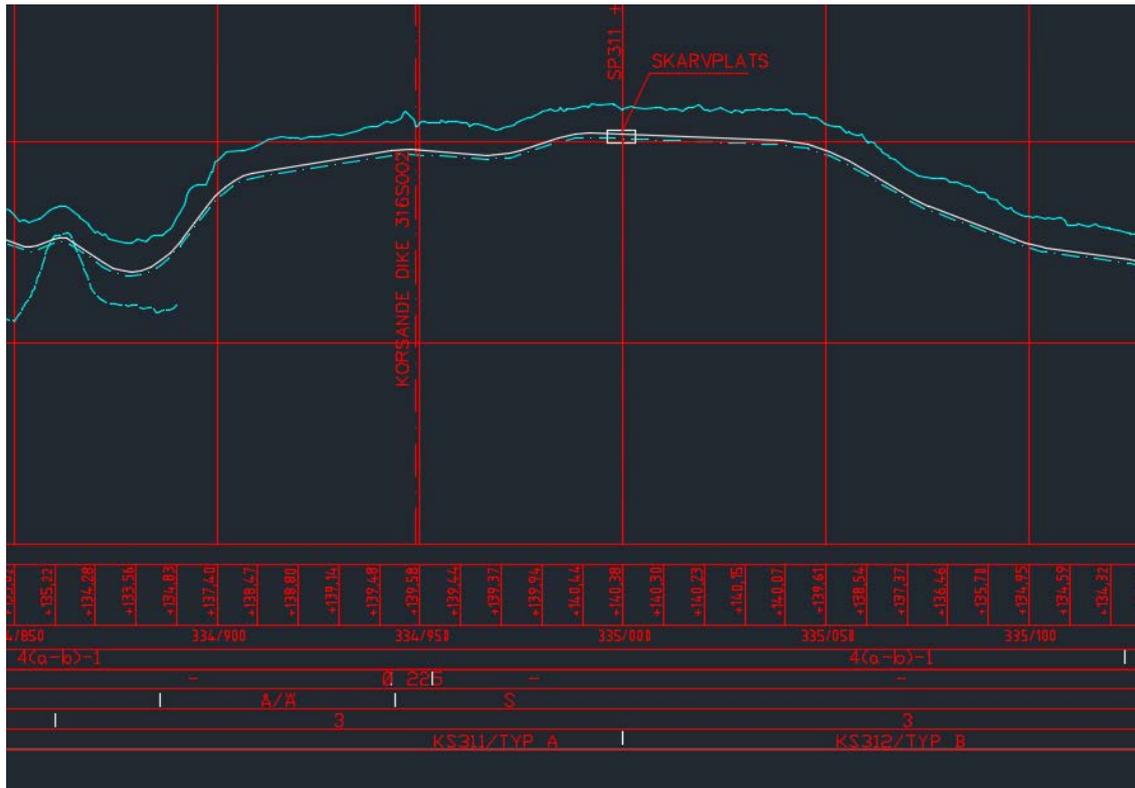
profile drawing from design documents, parts of the cable stretches 311 and 312. Cable joint in soil type B (design case 4 (a-b)-1). Smaller cable dimension type A located in type B soil.
